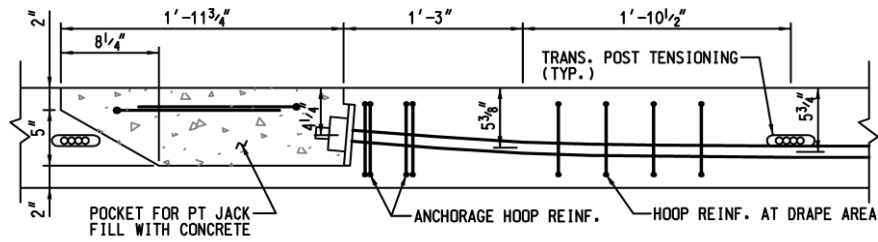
In-Span Longitudinal Post-Tensioning Anchorage³
